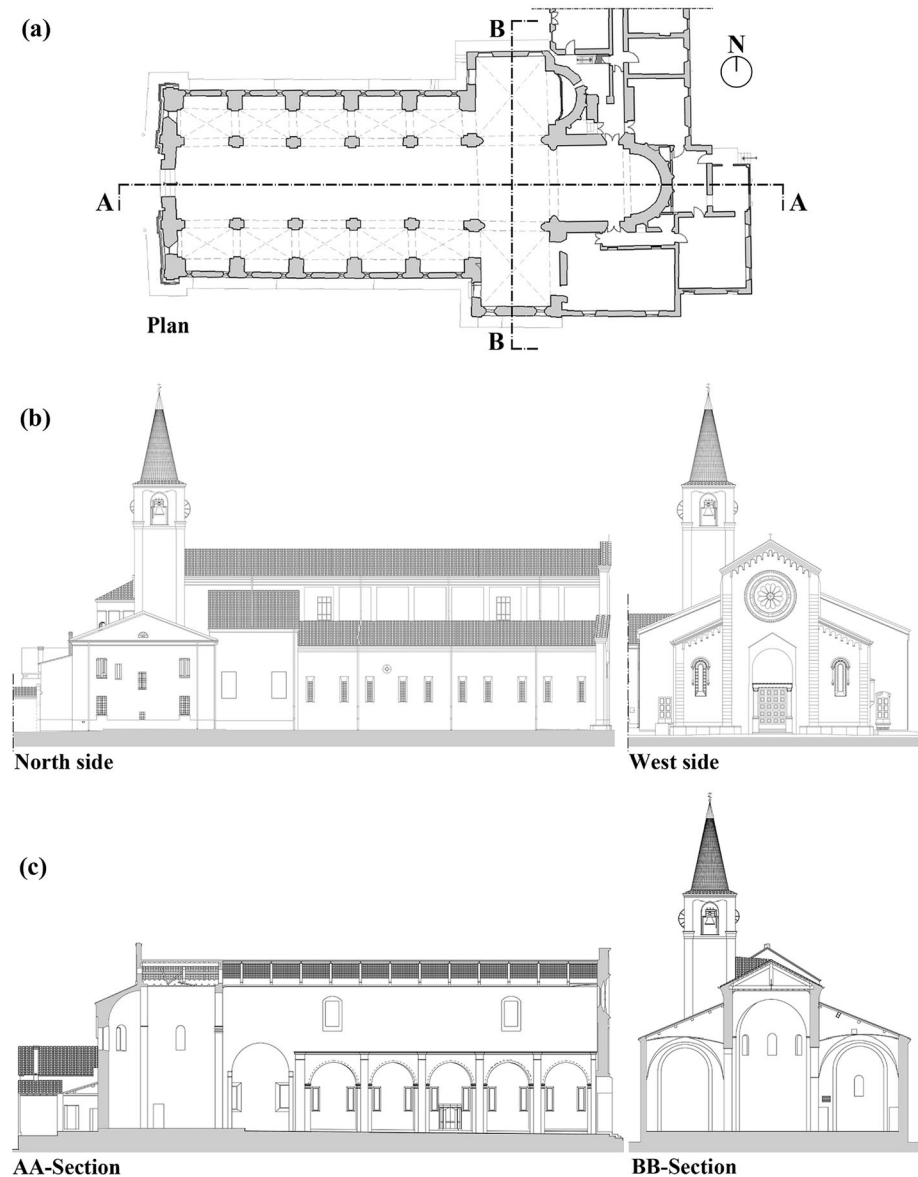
San Benedetto Abate church: a plan, b elevation views, c sections
